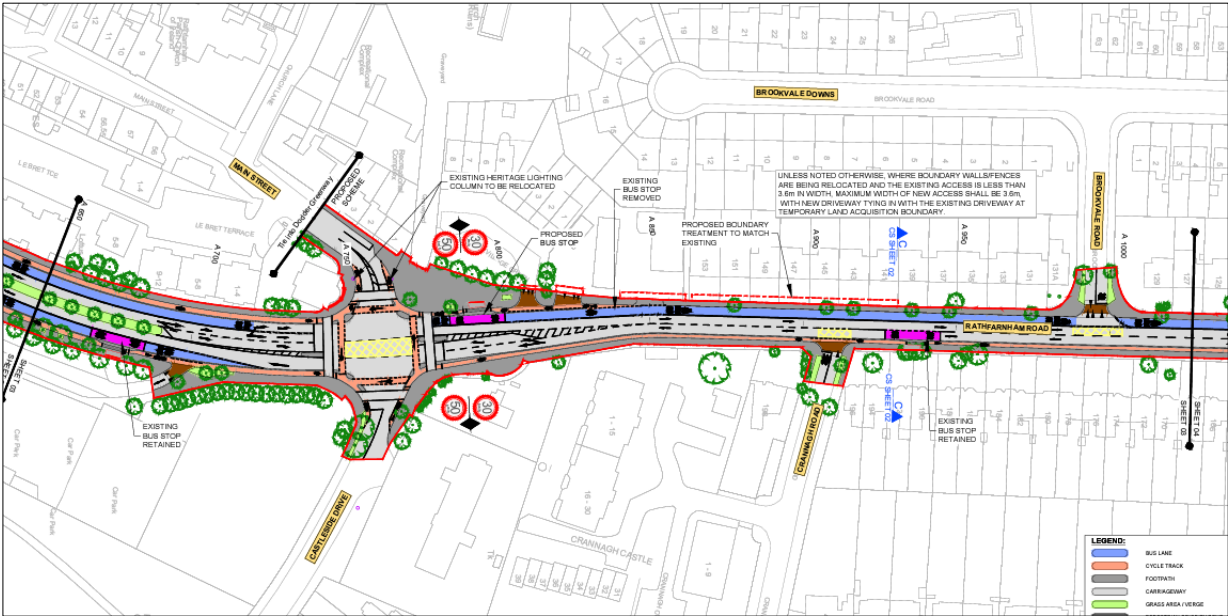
Extract from General Arrangement Drawings (Sheet 3)
